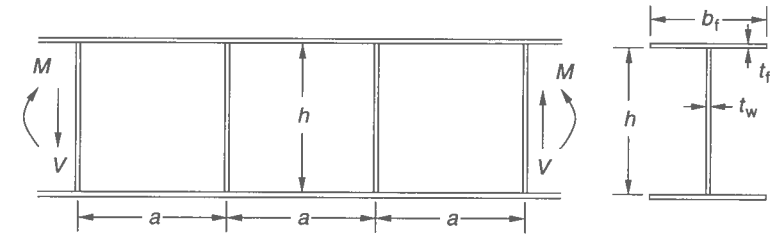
A plate girder under longitudinal bending and shearing forces
